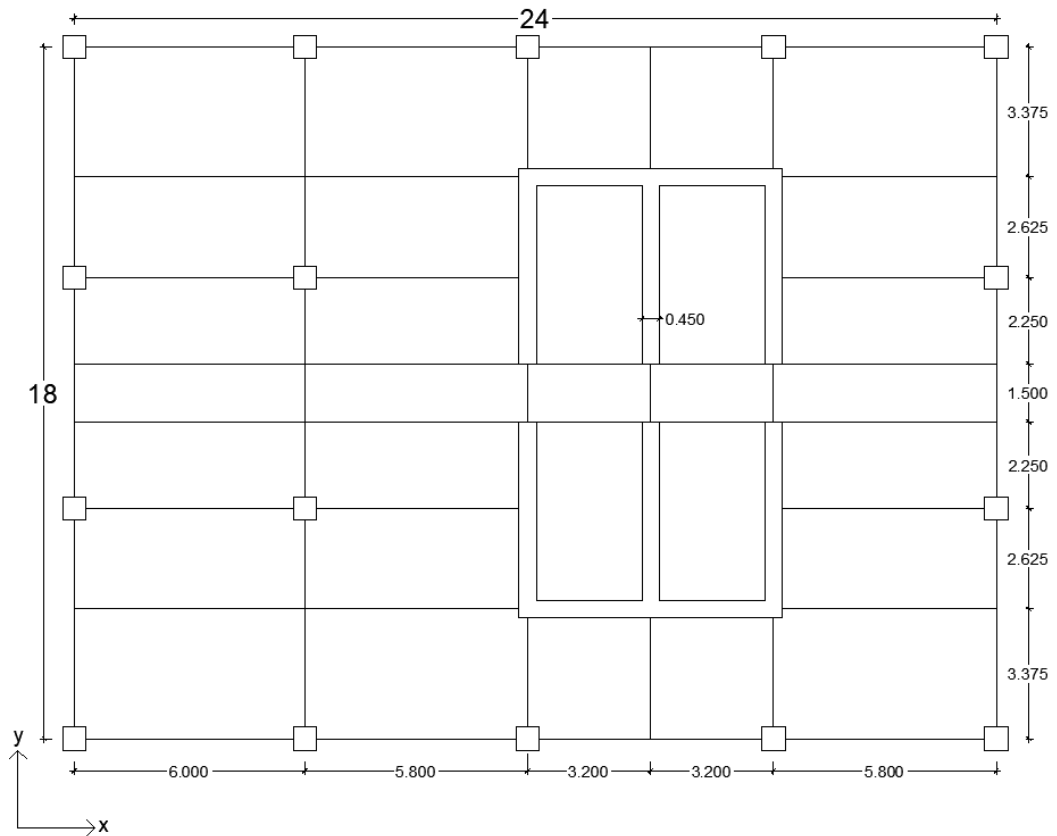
Floor plan of the asymmetric buildings (in meters)
